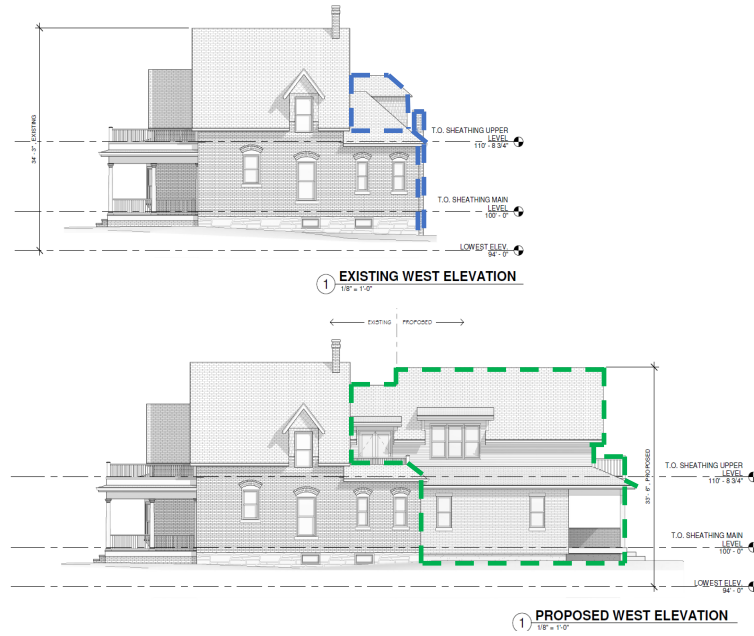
Existing above (area to be demolished in blue) and proposed below (new construction in green) west elevation
